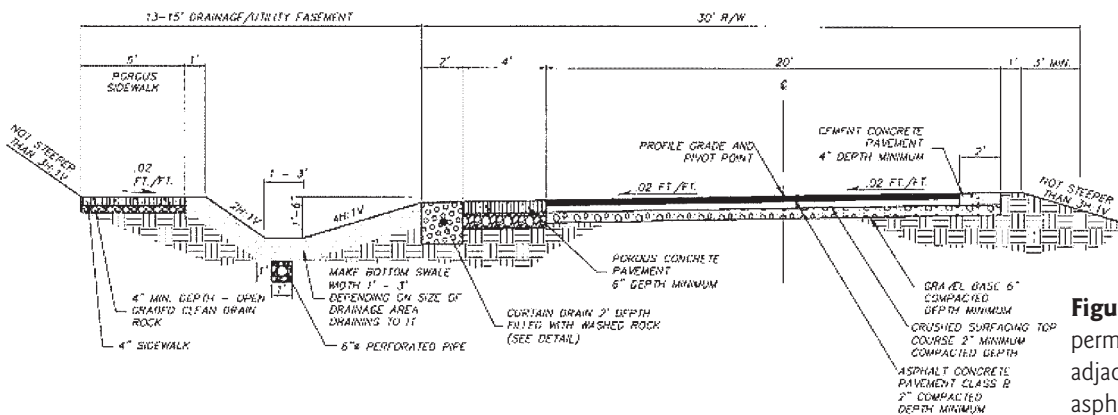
Four-foot permeable paving section adjacent to conventional asphalt roadway.
